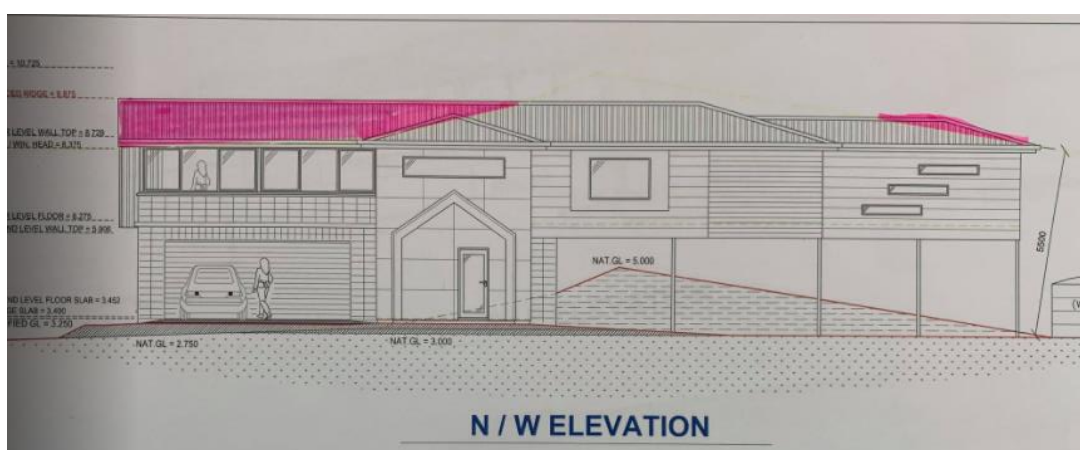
Identifying the greatest extent of the protrusion from the building envelope.
